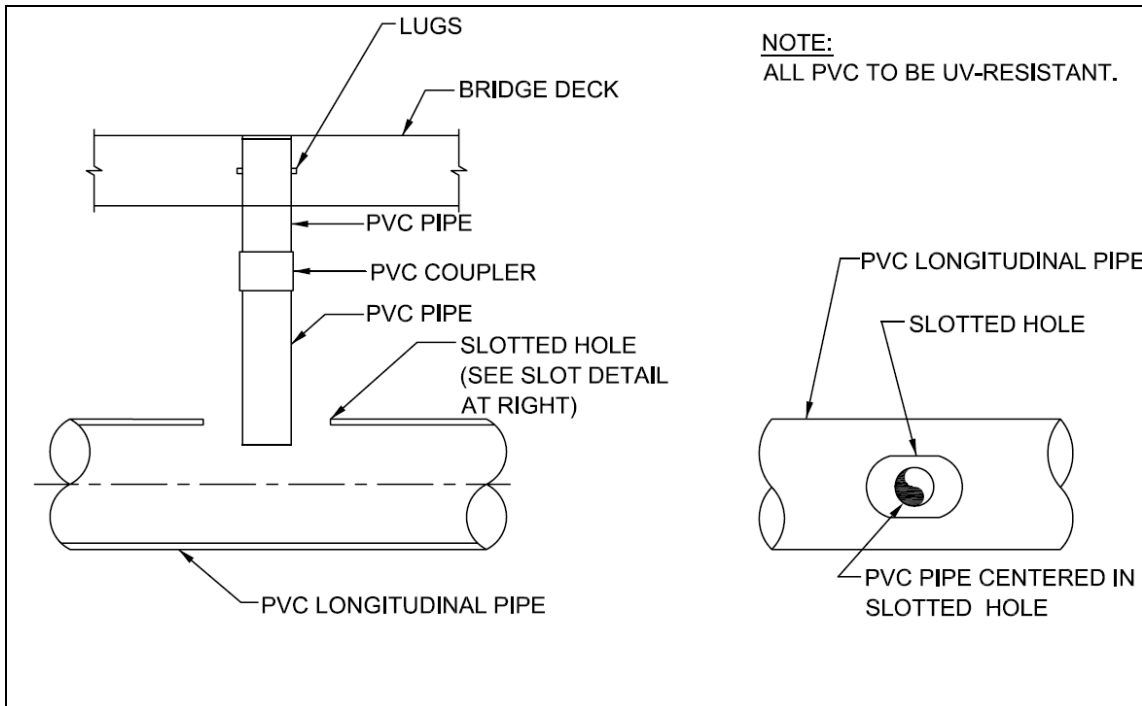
Profile view of a bridge drainage system for a girder bridge (NCDOT, 2008a).
